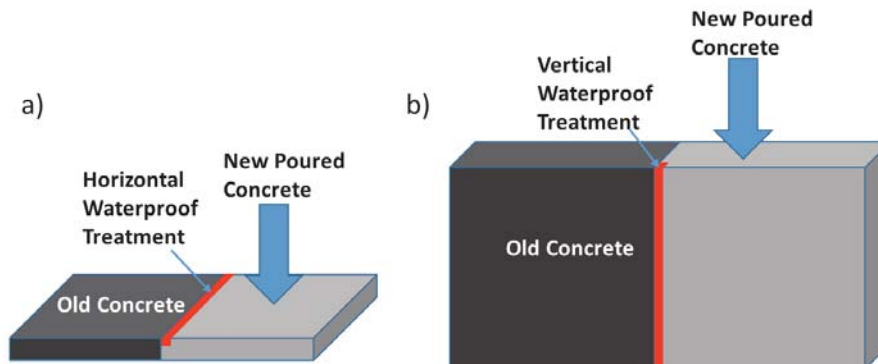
Designs for old-new concrete interface tests: a) with a horizontal joint and b) with a vertical joint.
